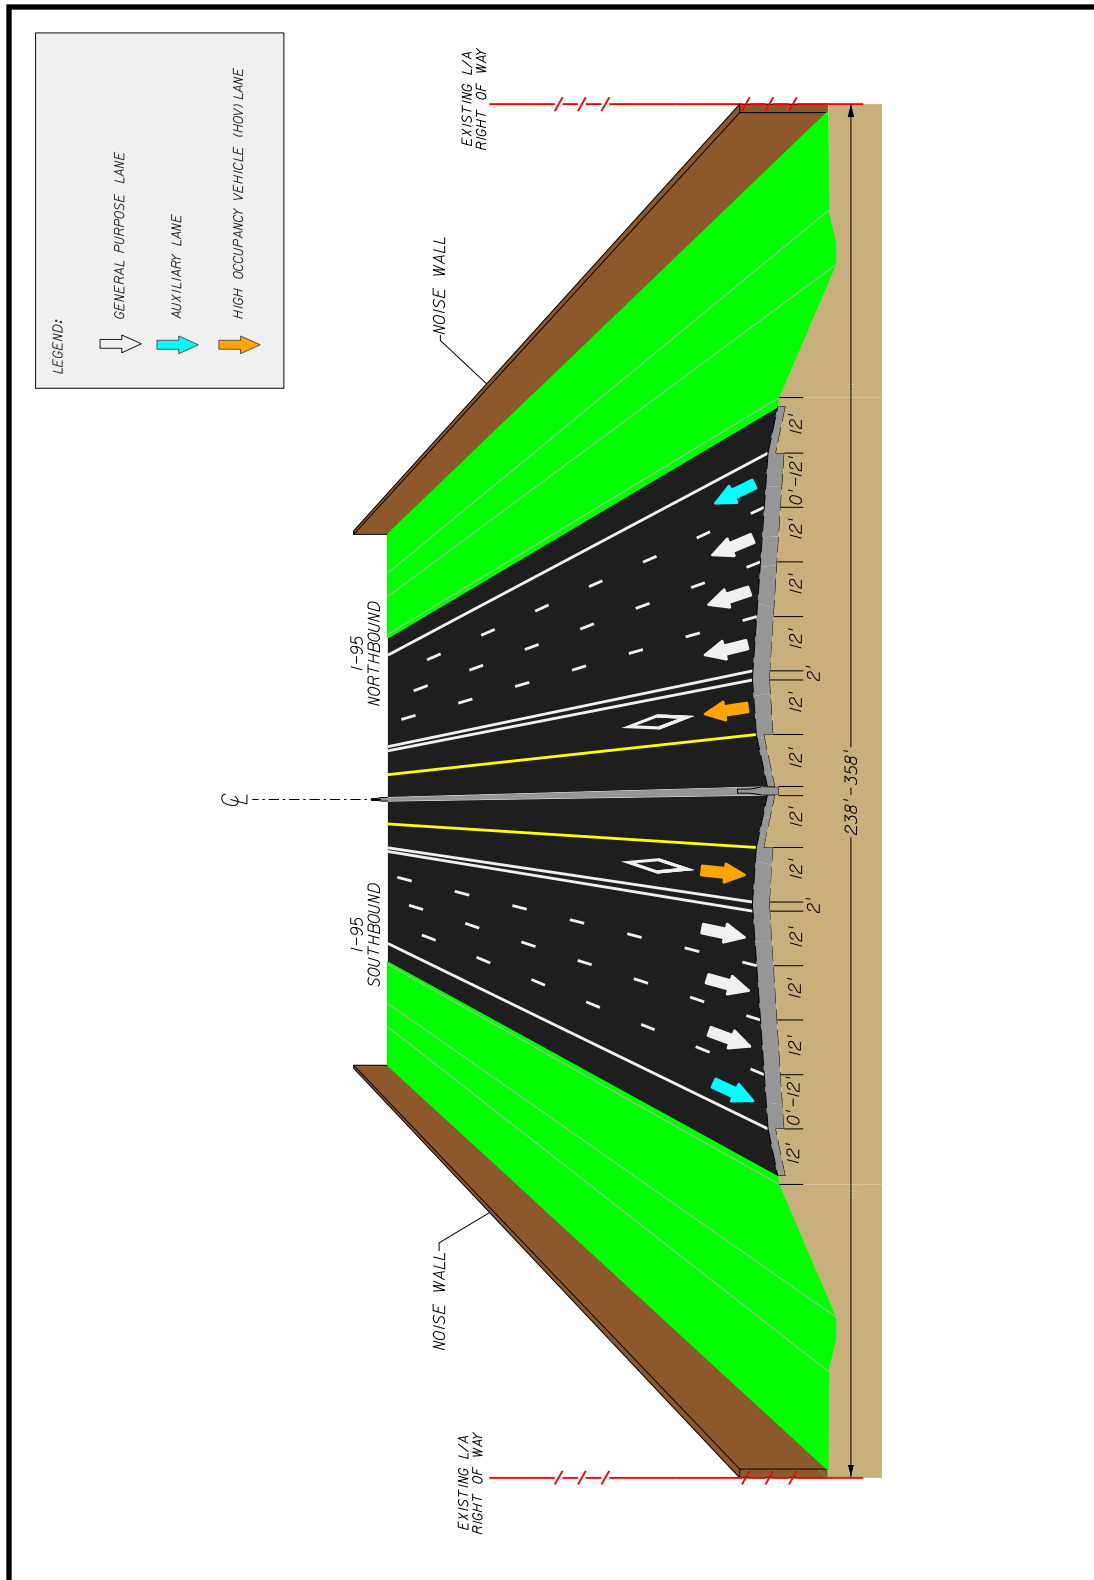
Existing Typical Section between Commercial Boulevard and Glades Road
